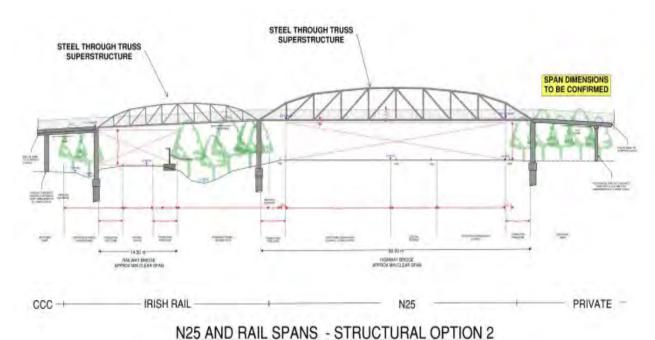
Structural option 2 indicative elevation with N25 span, Irish Rail span start of approach ramps
